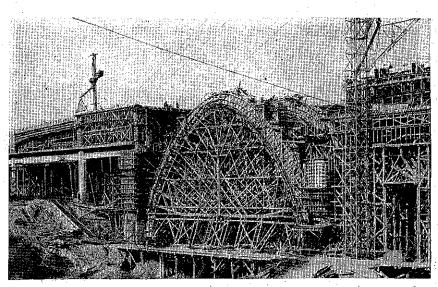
Mill Creek arch of 109-ft. span was poured in wood forms supported by an elaborate system of timber falsework.
